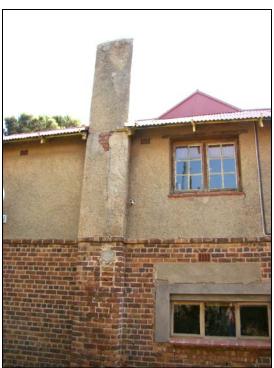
North view showing the lower and second storey windows and the ridge of the roof.
